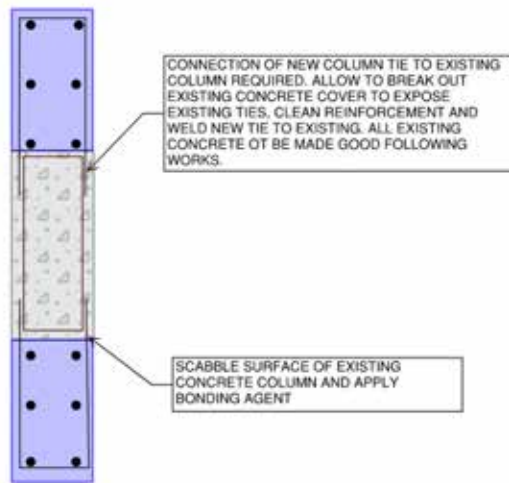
Column Strengthening of Internal Columns at Hotel Rooms
